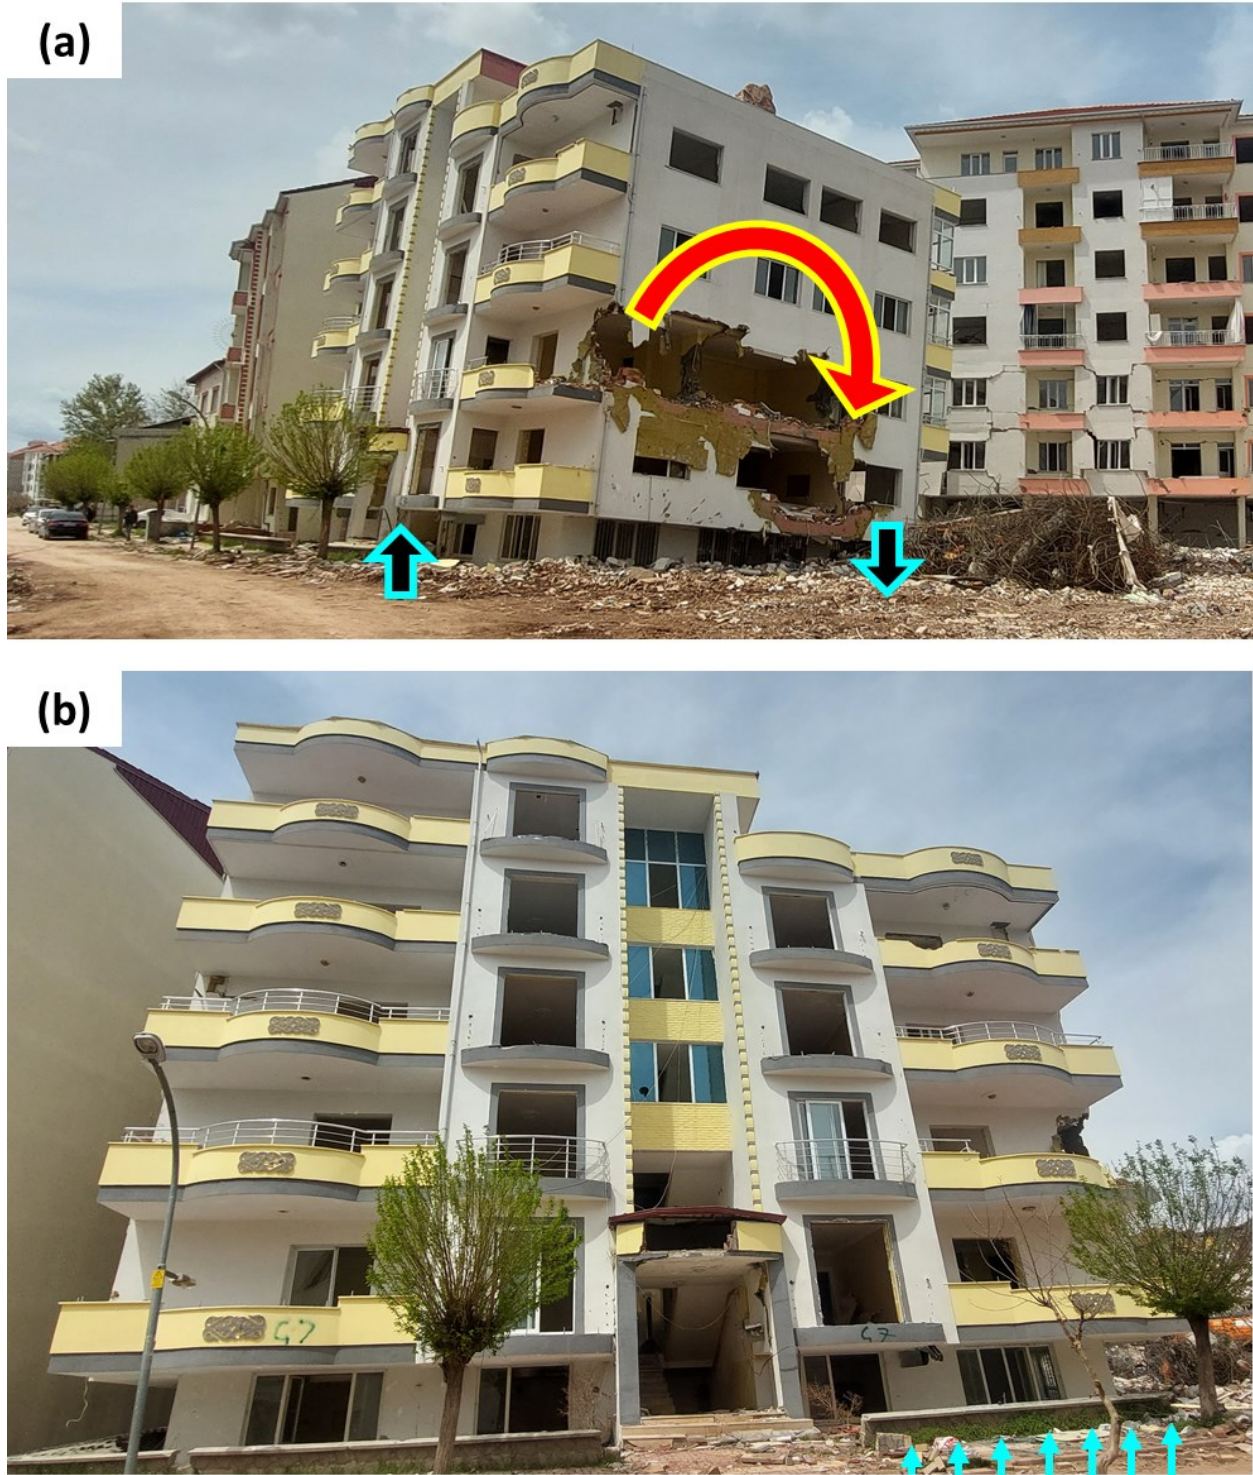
(a) Complete and (b) detailed view of a rotated 6-story RC building (37.787913N, 37.646741E)
